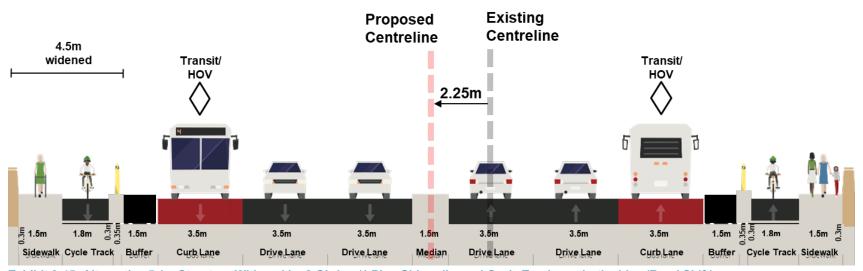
Alternative 5.1 - Structure Widened by 2 Girders/1 Pier, Sidewalks and Cycle Tracks on both sides (Road Shift)
